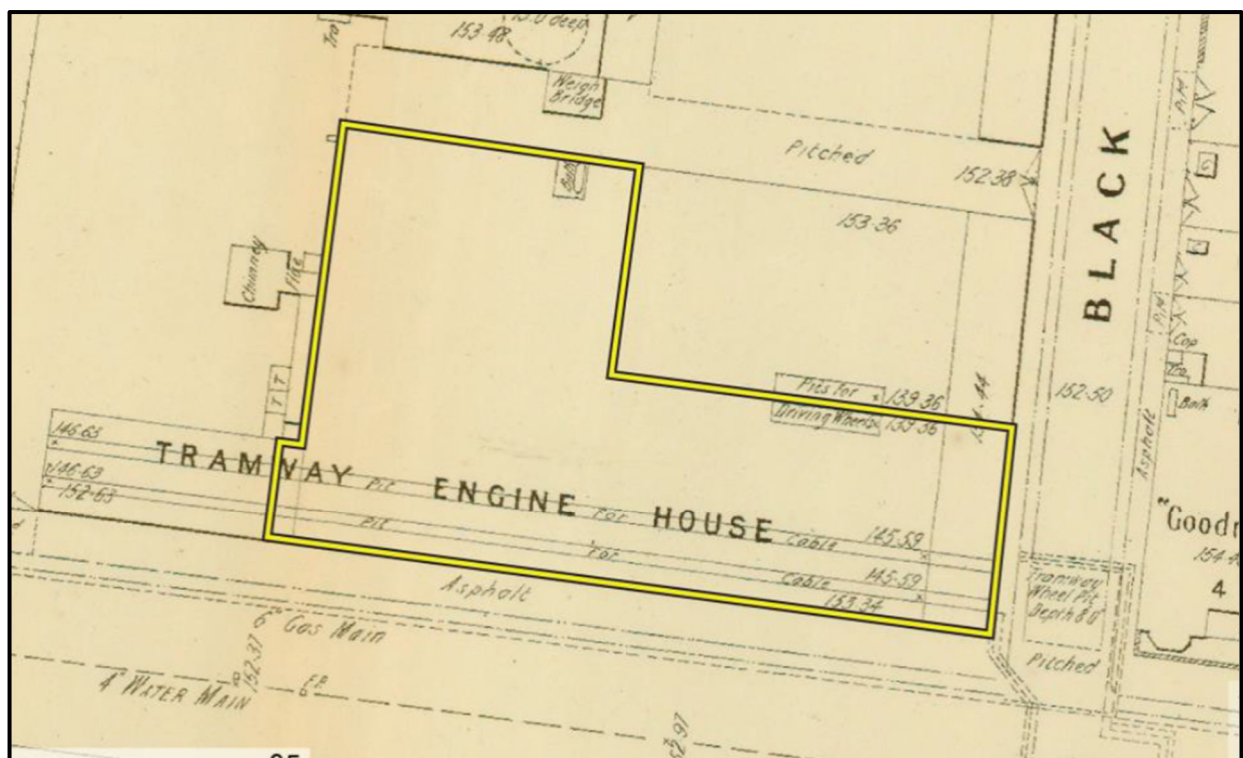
Extract from Melbourne & Metropolitan Board of Works Detail Plan
